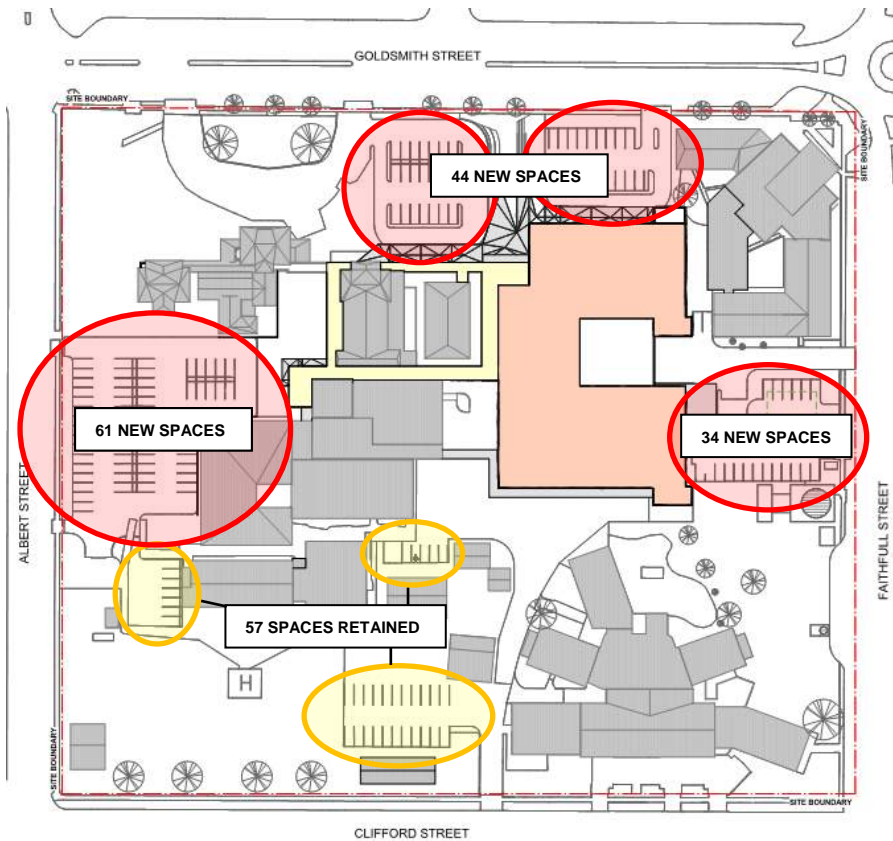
Proposed Car Parking Locations, extract from the Transport and Accessibility Assessment (Source: TTW)
